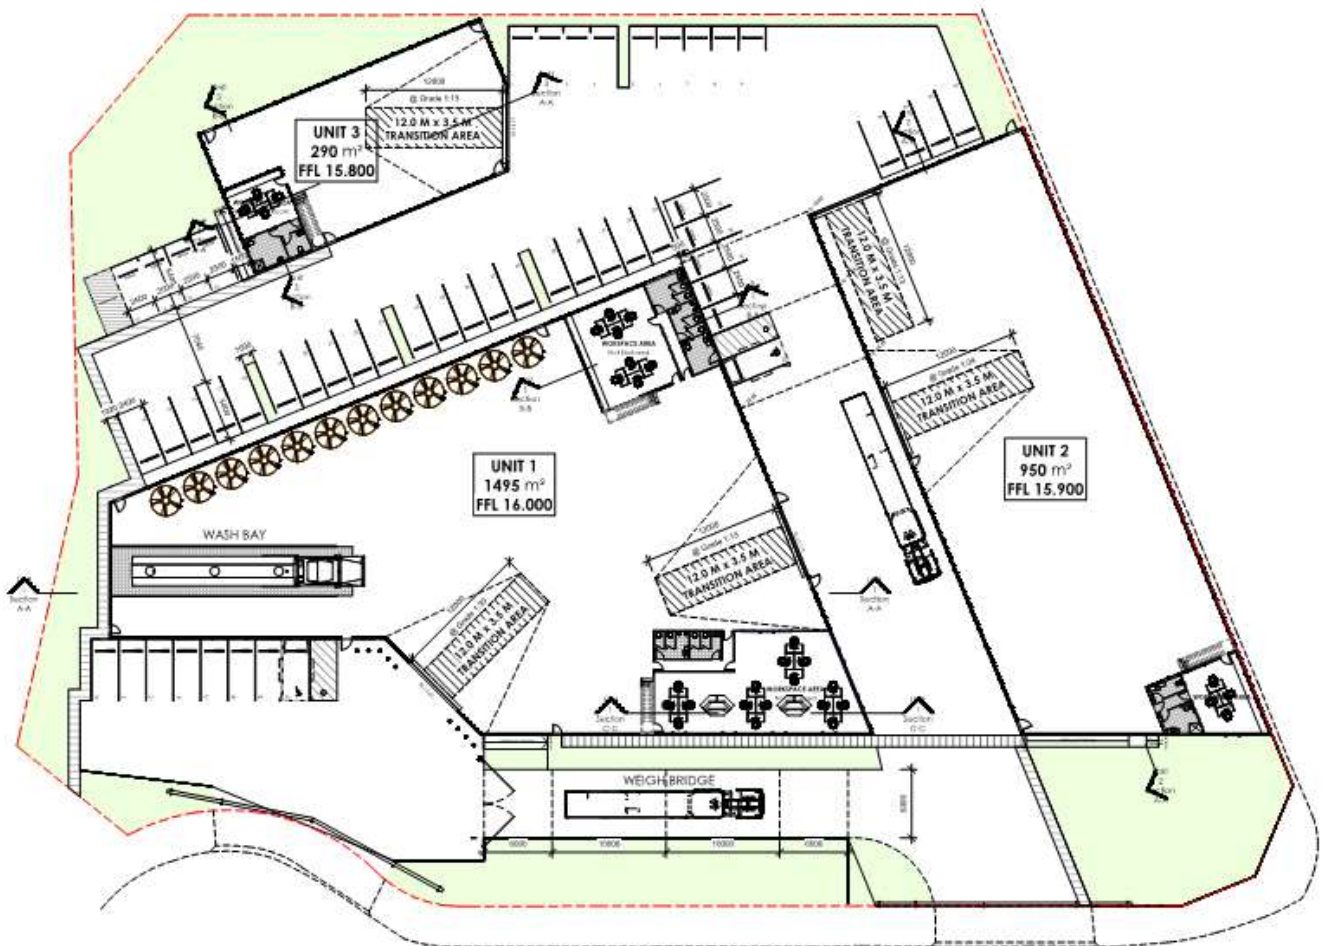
Architectural Plan – Site Plan – Baini Design, Ref:18117
